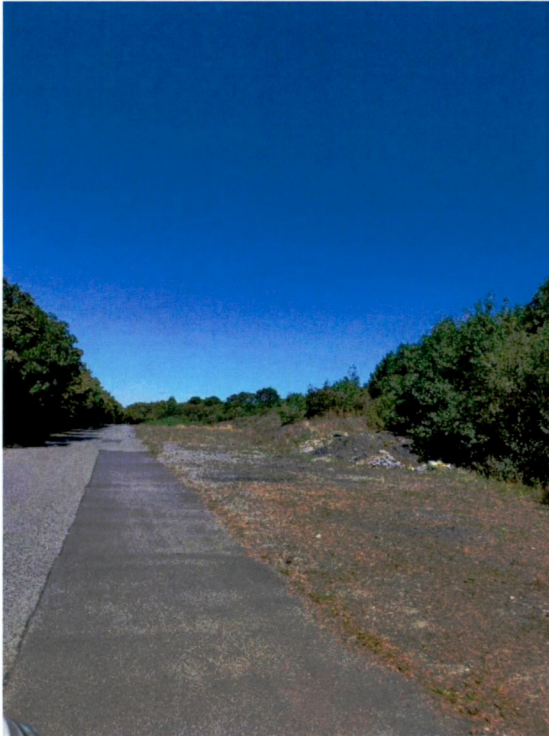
Site Entrance through local road that connects the site from Naas Road to Garter Lane
